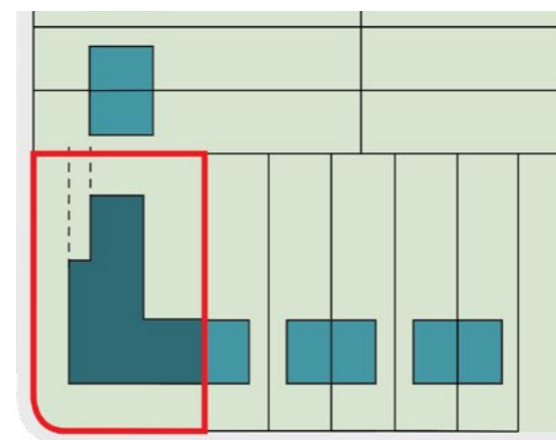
As a redevelopment proposal, the new building could extend beyond the prevailing building on the secondary street to optimise the street.
